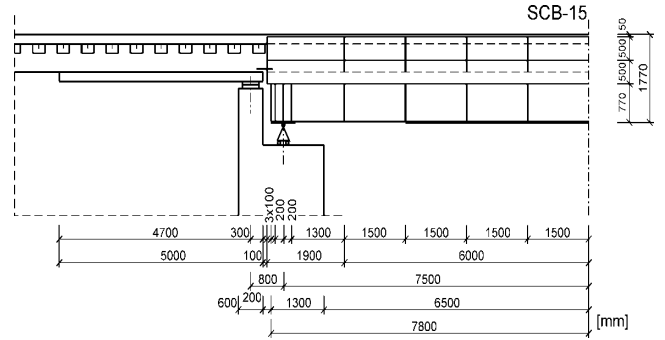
Longitudinal section of symmetric SCB bridge and approach slab zone
